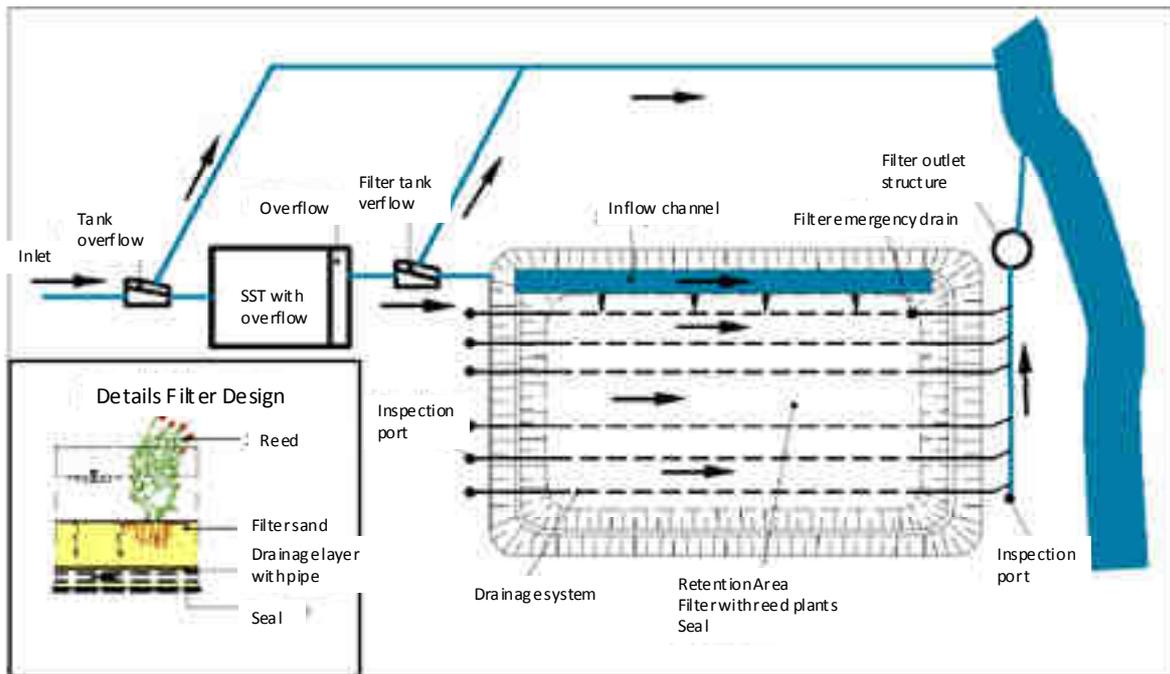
System sketch plan view retention soil filter system, here with upstream filter tank overflow and stormwater sedimentation tank with permanent storage [Uhl, M. et al., 2006; p. 93]
